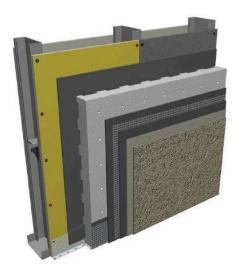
PUCCS EIFS with moisture barrier over glass-fibre-faced gypsum sheathing and cement board
